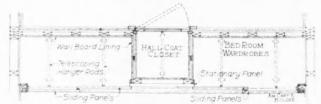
Cross Section of Clouts and Door in Improved "New Way Wardrobe,
